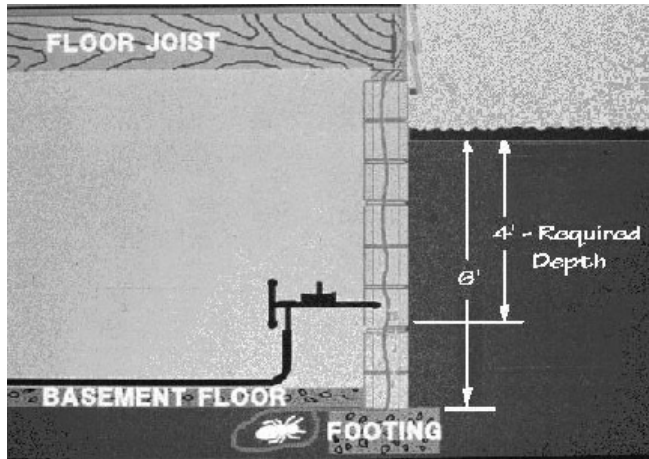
For best protection, the termiticide should be injected to the basement footings.
